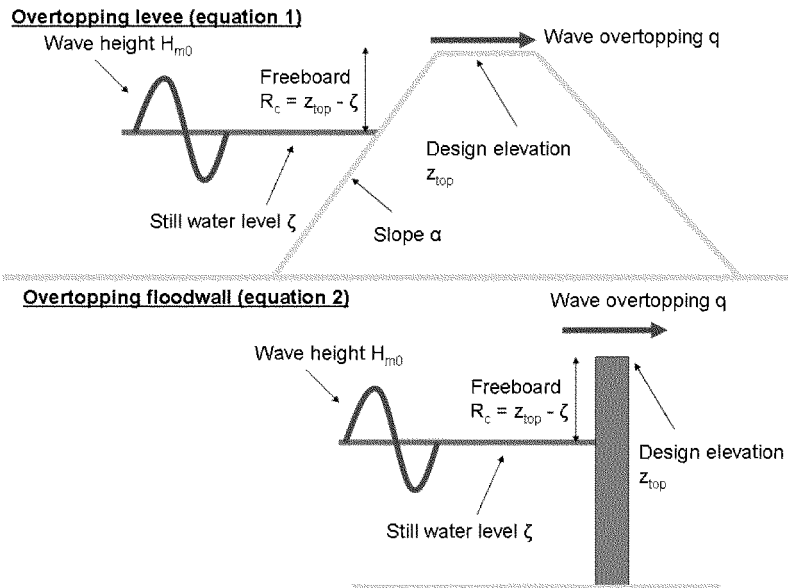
Definitions for Overtopping for Levee and Floodwall
